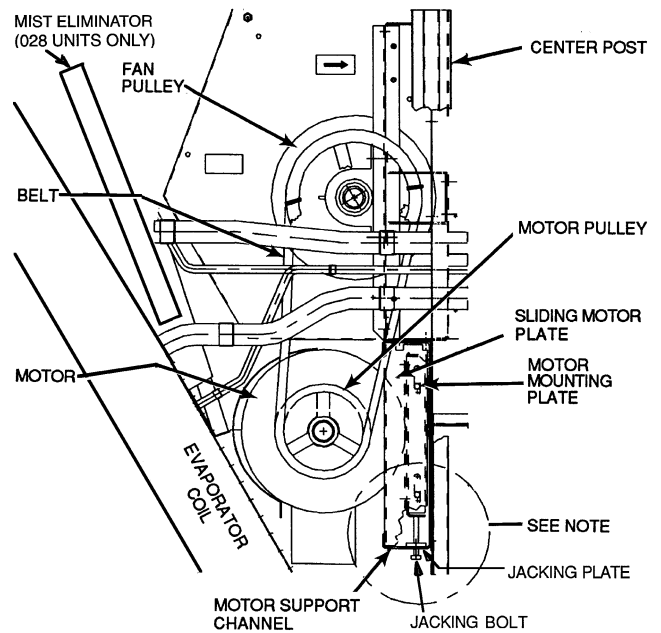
50TJ016 Evaporator-Fan Motor Section
